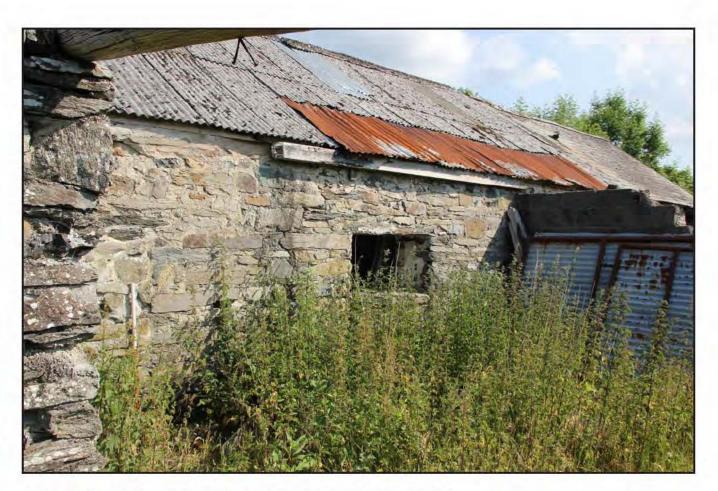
Southeast facing external elevation (southwest end), from the south. Scale 1.0m.
